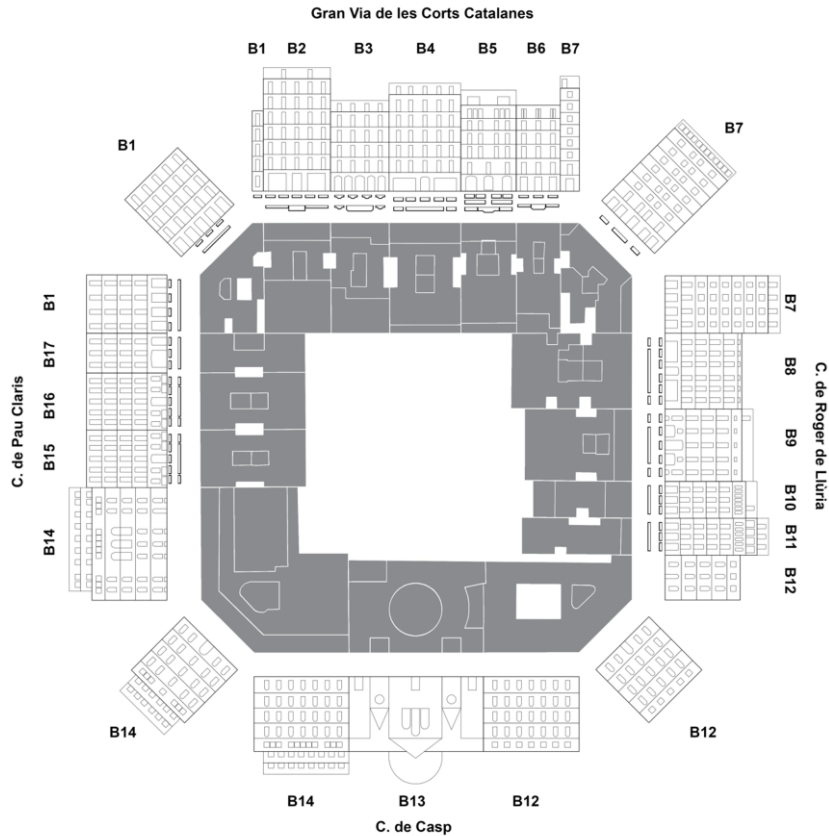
Geometrical configuration of the specific urban block with the main façade elevations of the existing buildings (Rago, 2022).
